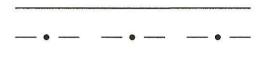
TWIN CENTRAL LIGHTING ARRANGEMENT
